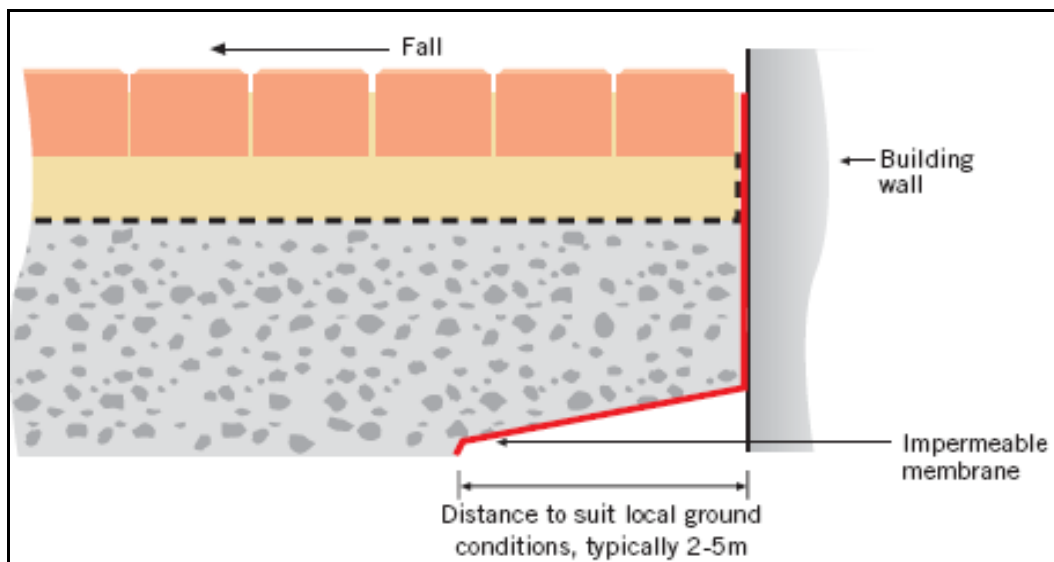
Section through a permeable surface close to building (Source: Interpave *Permeable pavements – guide to the design construction and maintenance of concrete block permeable pavements* dated 2013)
